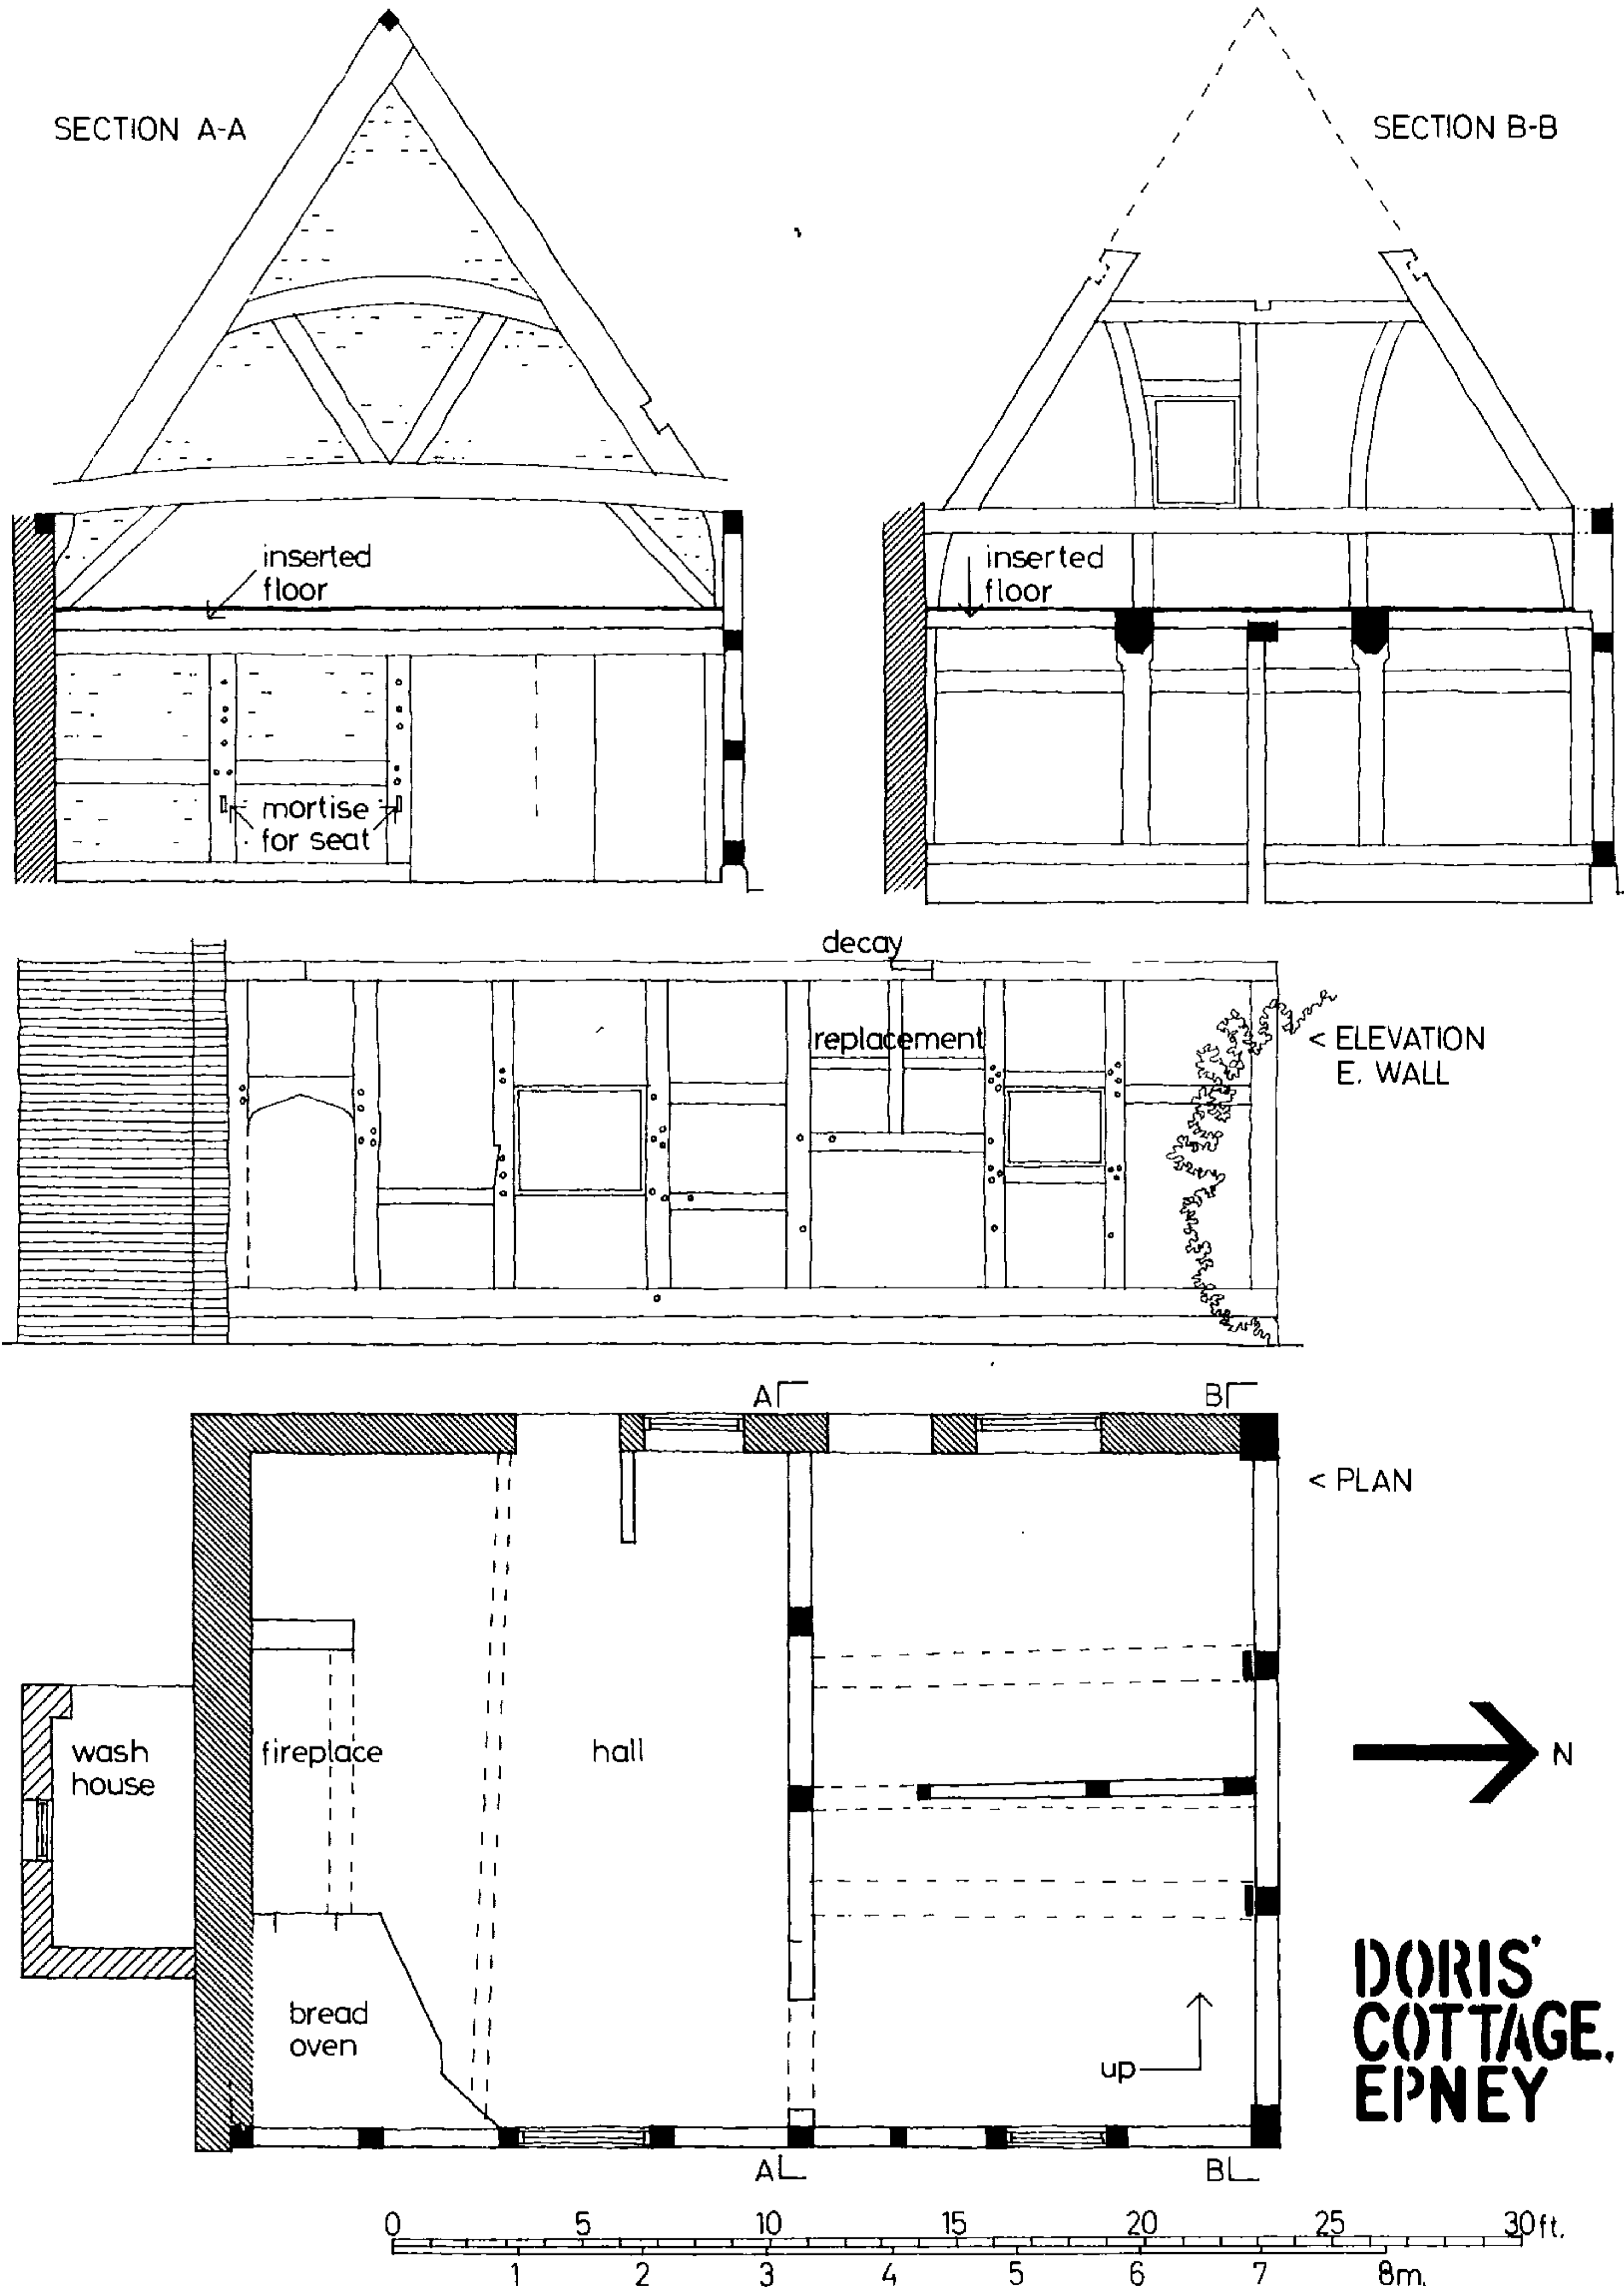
Doris' Cottage, Epney, Moreton Valence: plan, elevation, and sections.
